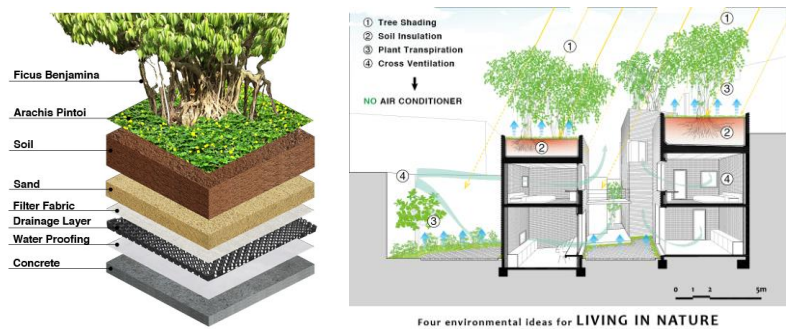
A typical cross section required for plantation on roof tops. (Sawa)
